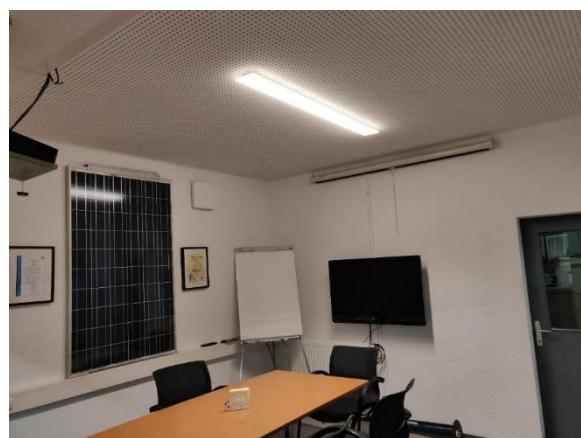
Single office and meeting room with new (heating & cooling) ceiling
